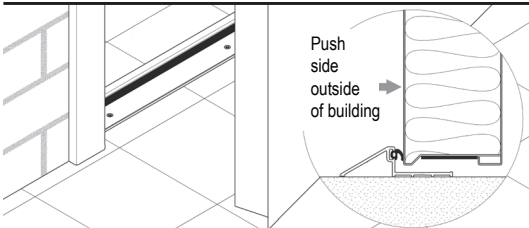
Figure E VERSION WITH FIXED LOWER ALU THRESHOLD
